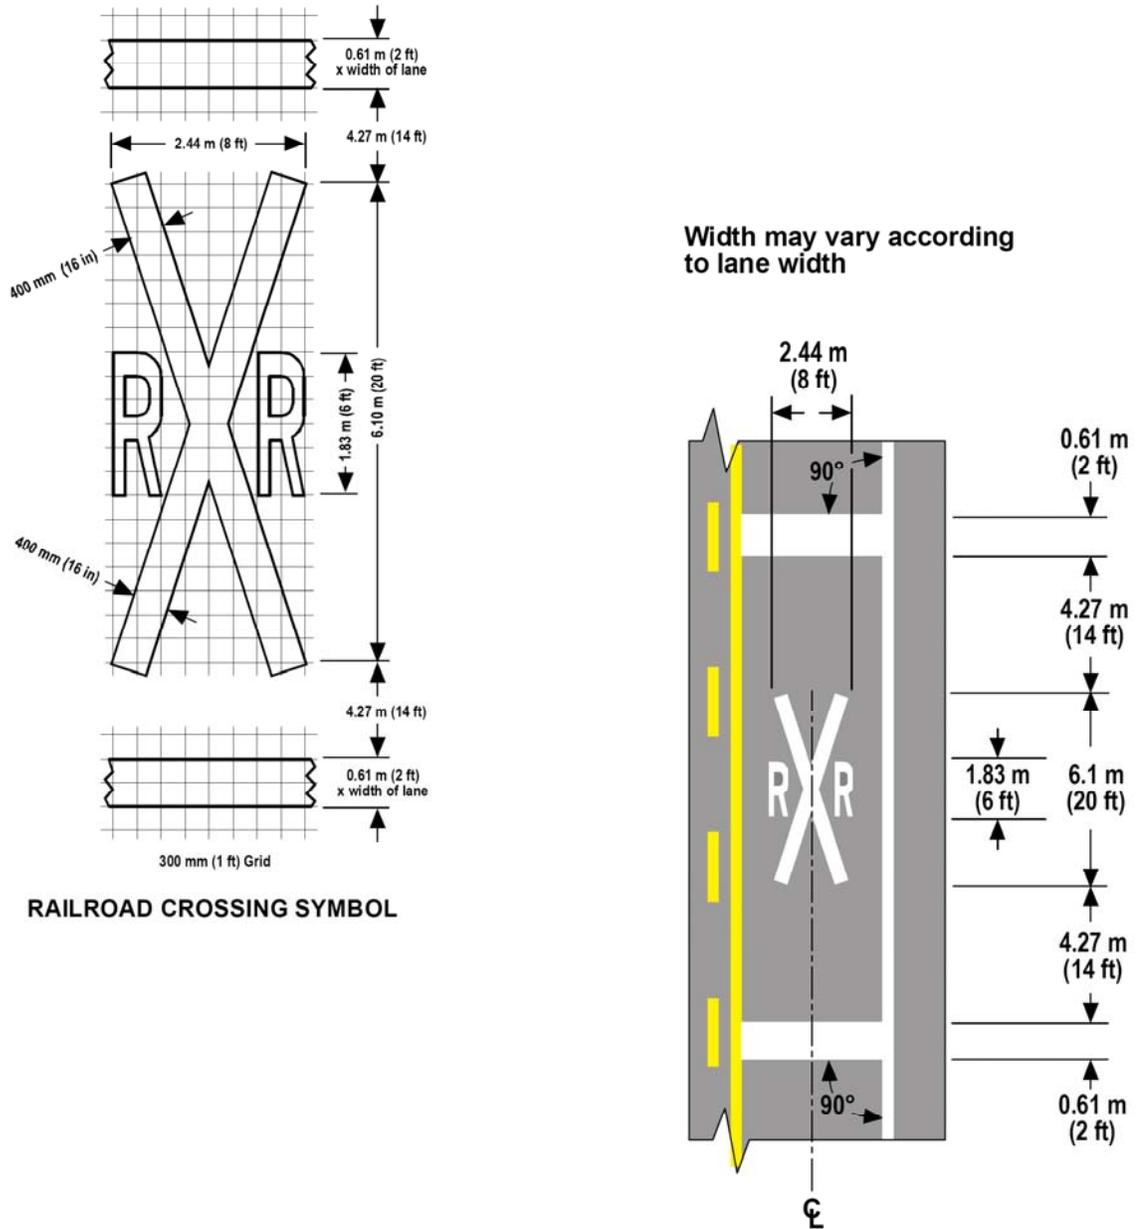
B-7 (CA). Examples of Highway-Rail Grade Crossing Pavement Markings
